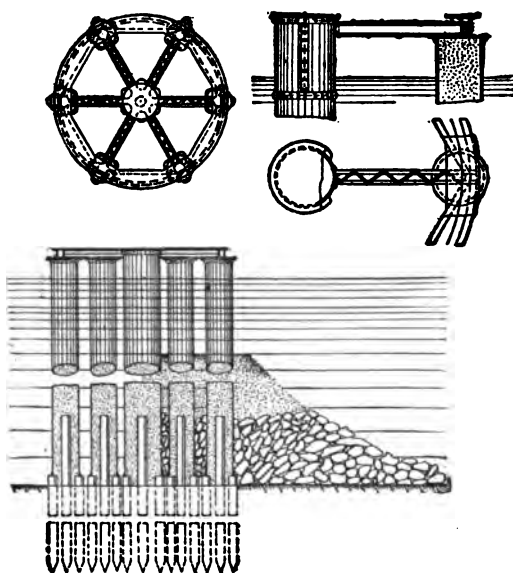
GROUP OF CYLINDERS FOR PIVOT PIERS.
